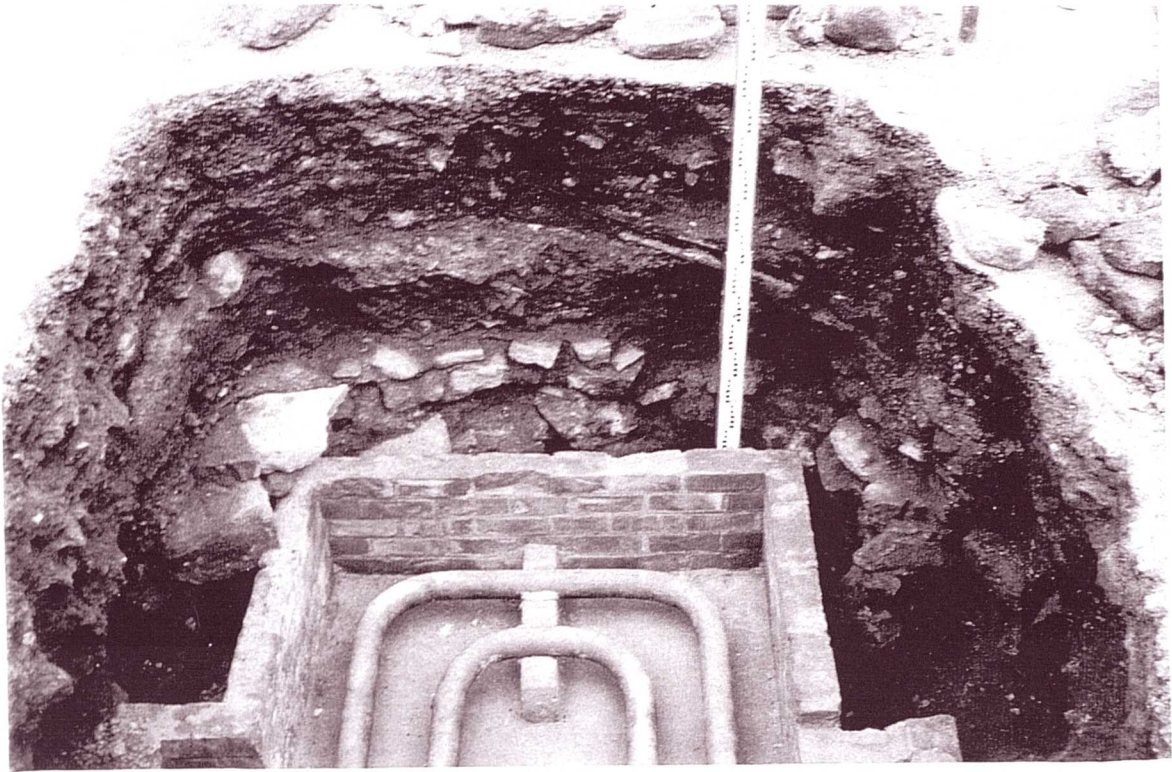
South section of Courtyard Heating Trench (DC91A);
